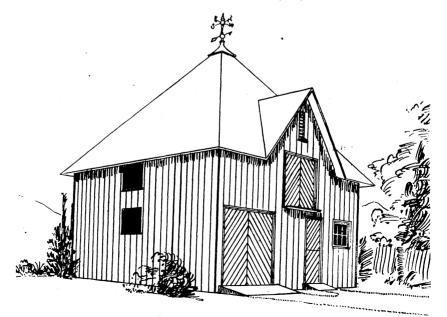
Showing perspective view of \$275 barn. (Design No. 2.)
